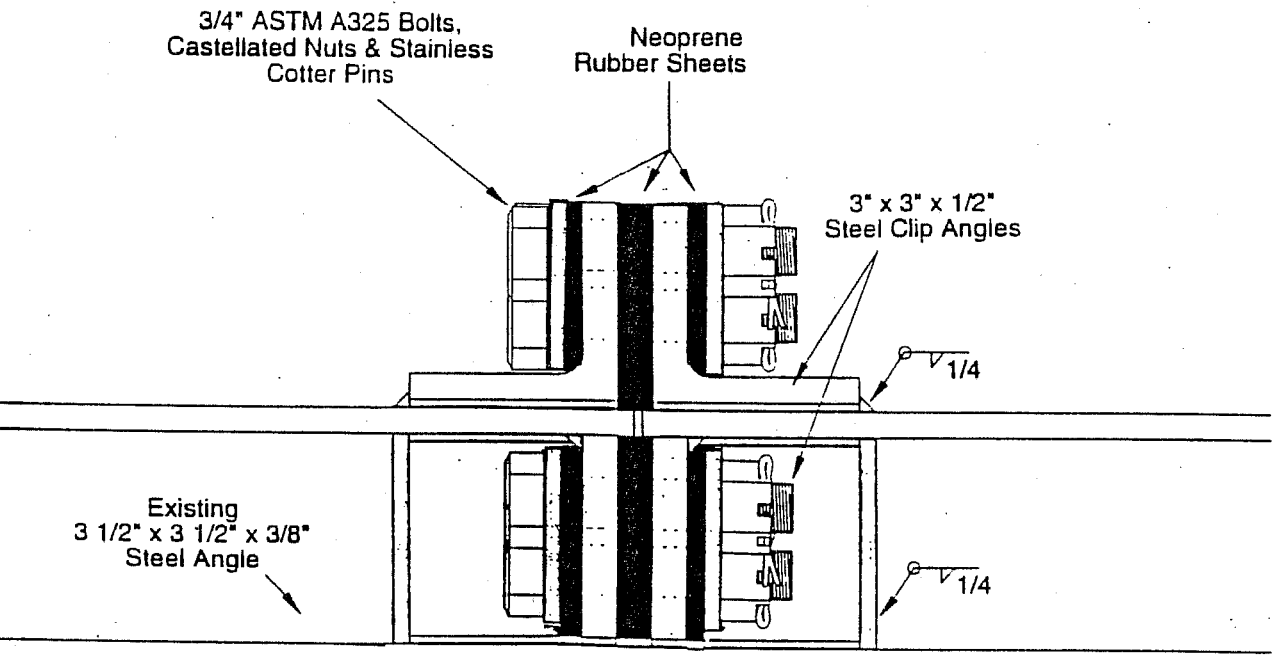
Alternate rubber sandwich connector, using clip angles and small plates. Clip angles may be bolted or welded onto the existing X-brace or lower chord angles of the existing steel diaphragm.
